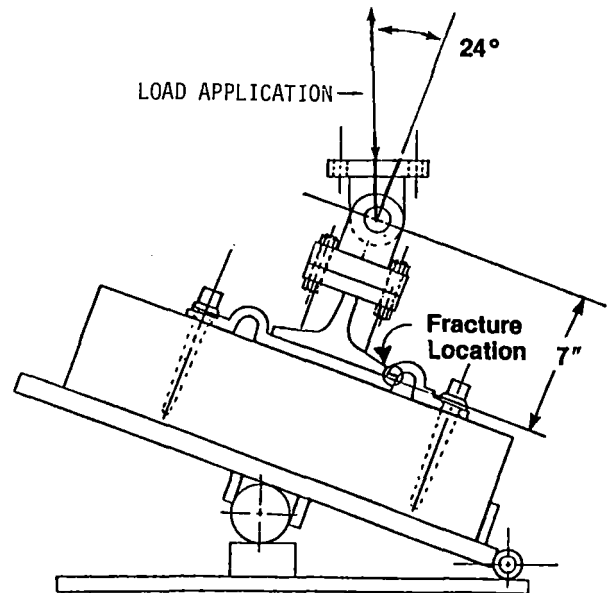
WOOD TIE FASTENER FATIGUE TEST SCHEMATIC AND FAILURE.
